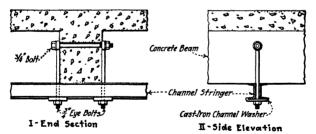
Eye bolts hung on horizontal bolts through a concrete beam for supporting stringers to which a motor is to be attached.
